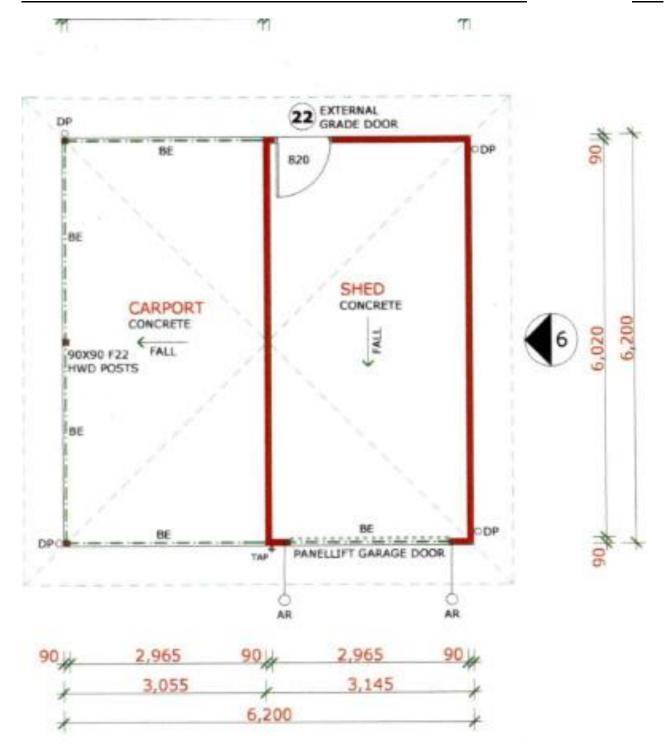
Extract from the approved plans of Development consent 10.2016.120.1 showing the approved floor plan of the shed and carport structure.
